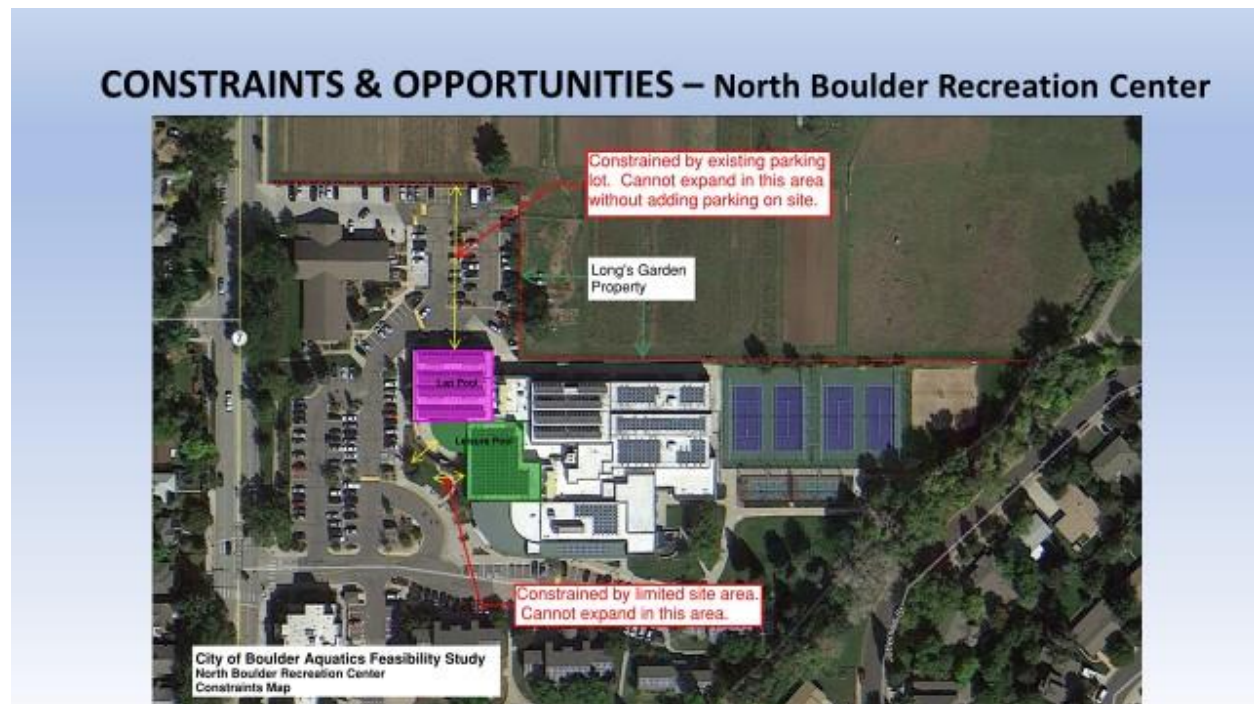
Constraints and Opportunities - North Boulder Recreation Center
